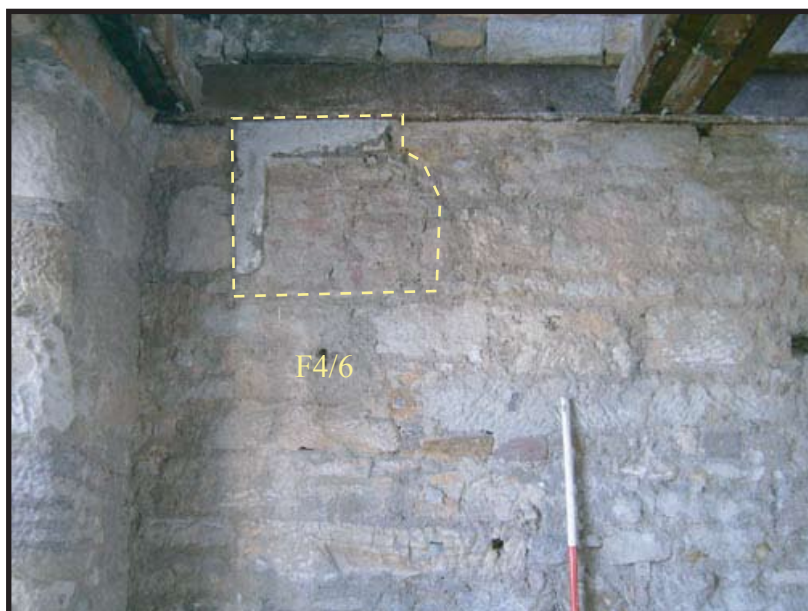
Detail of bricked up bearing box on the south side of the west wall on the fourth floor F4/6
